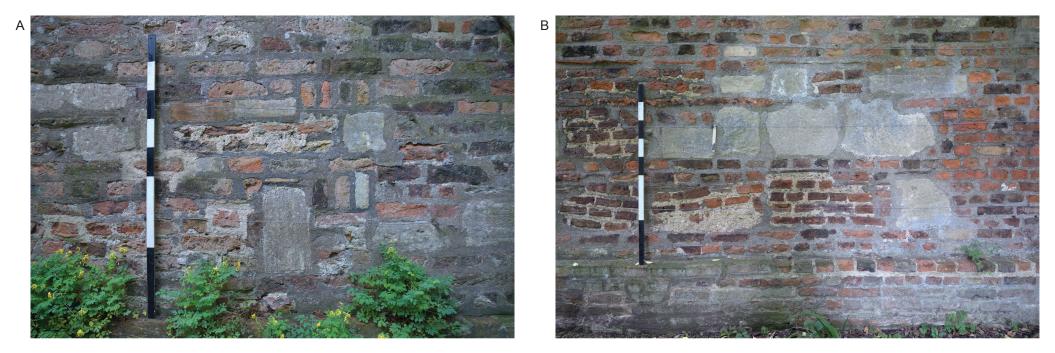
Photographic survey of the west-facing elevation of the west Chimney wall, with inset details showing extensive use of reused masonry and repeated episodes of repair and repointing undertaken to the fabric
